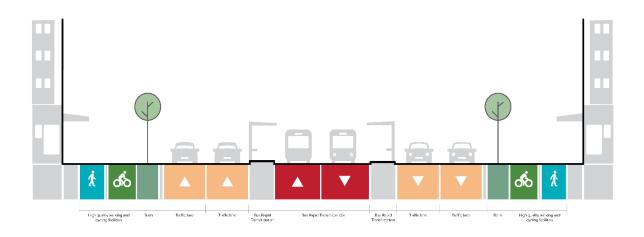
NoR 1 and NoR 2 Typical Cross Section
